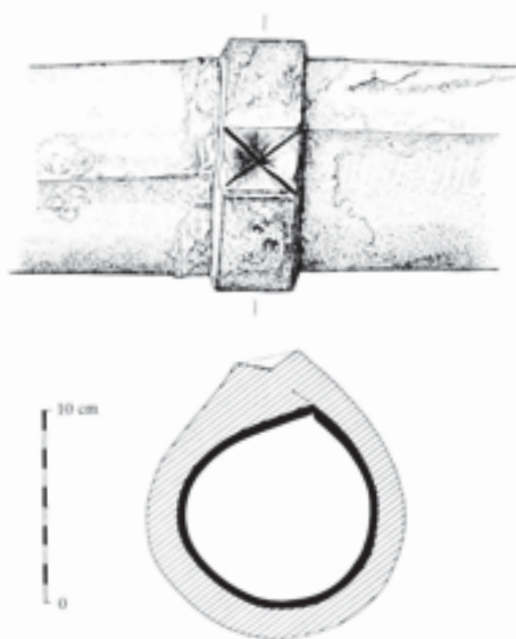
Plan view and cross-section of the lead collar ('crampet') joining pipe lengths 1 and 2. Scale 1:4. Drawn by Richard Bryant
